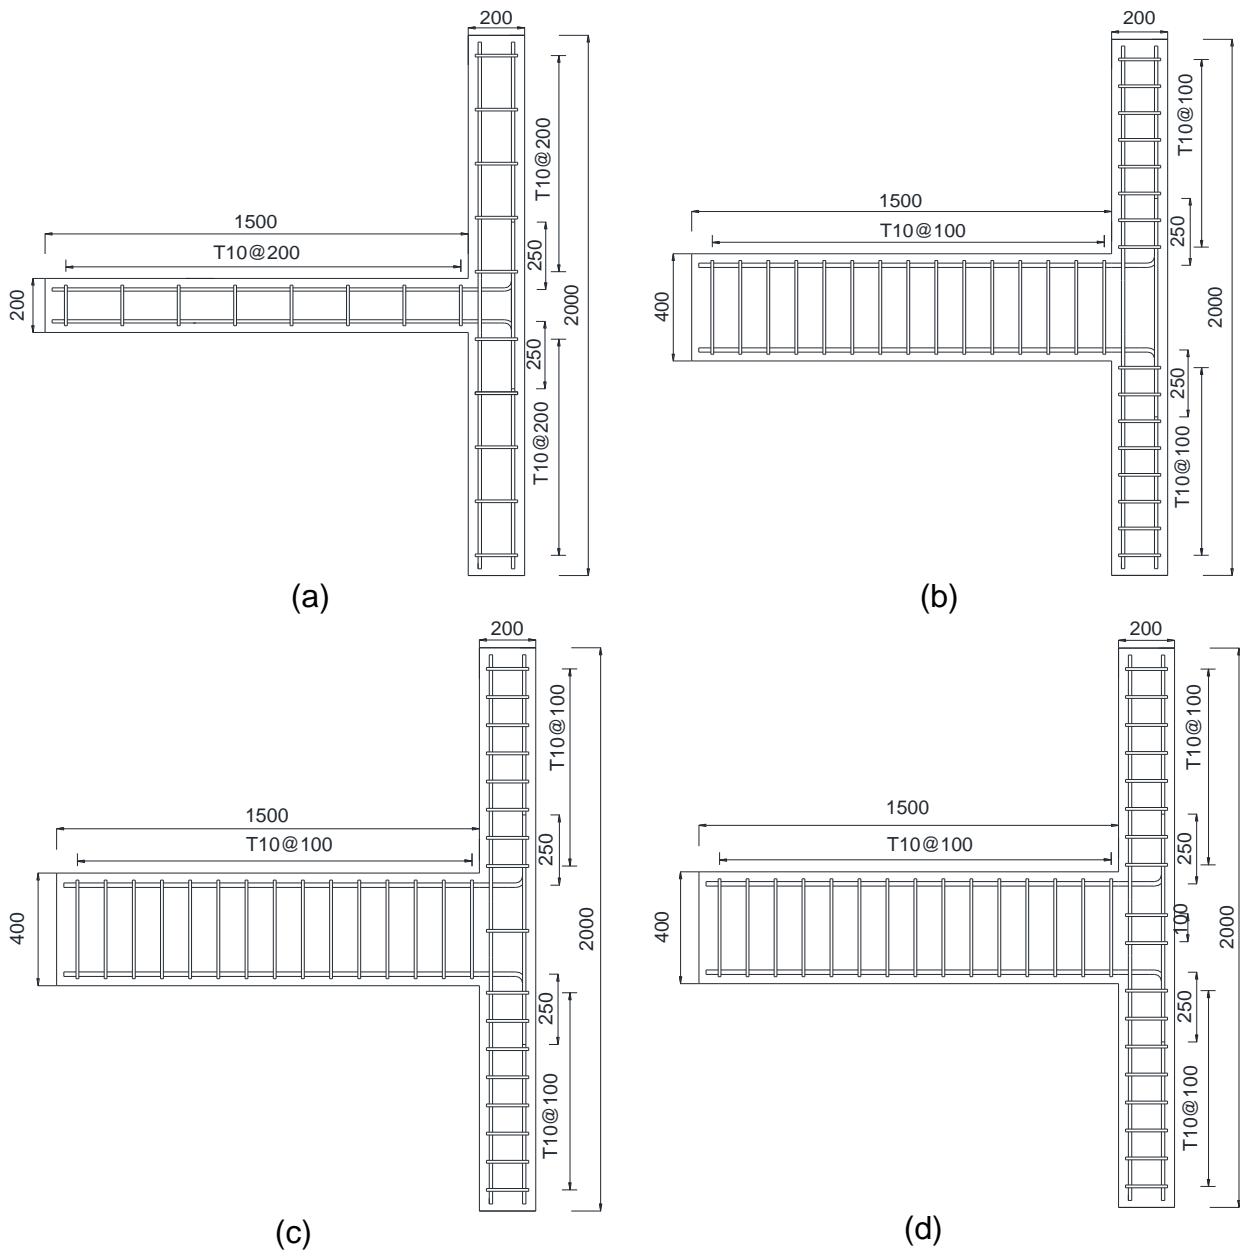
Details of reinforcement and geometry of the specimens: (a) specimen HKOL-200; (b) specimen HKOL-400; (c) specimen HKOL-400-L; (d) specimen HKOL-400-LL (dimensions in mm)
